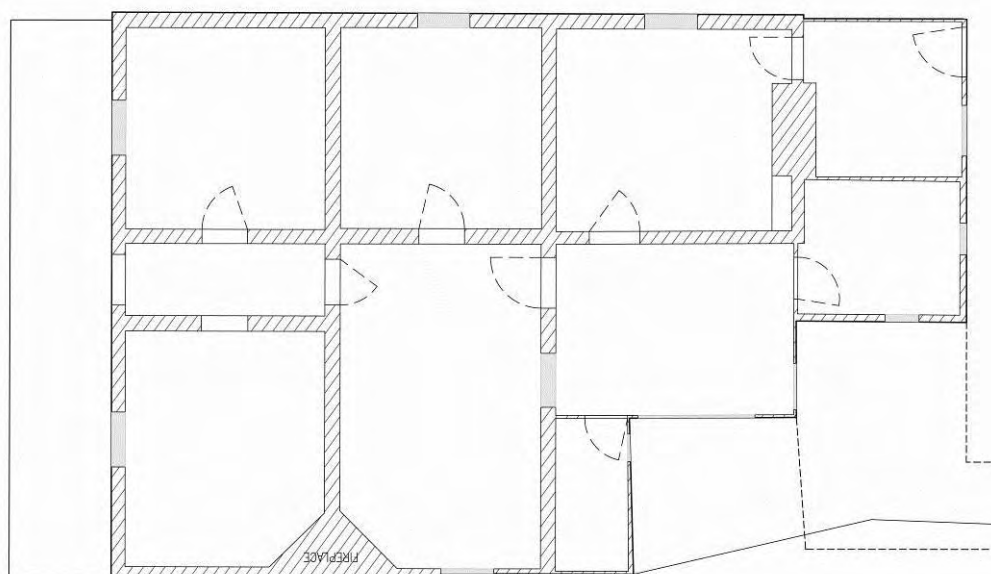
Floor plan showing the internal layout of the former School Master's Residence. (Source: Craig & Rhodes, 2010)
